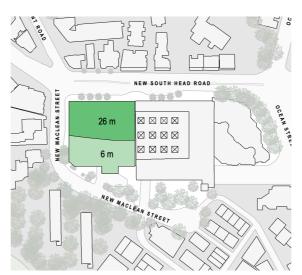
Woollahra LEP 2015 Envelope. Built form on Subject Site
